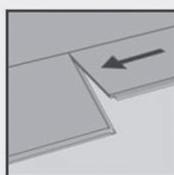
Cut with a jig saw - hardwood turned down to eliminate/reduce damage to the face of the panel. Or if cutting using a hand saw, cut it with the hardwood visible face up. Then install it as previous plank.
